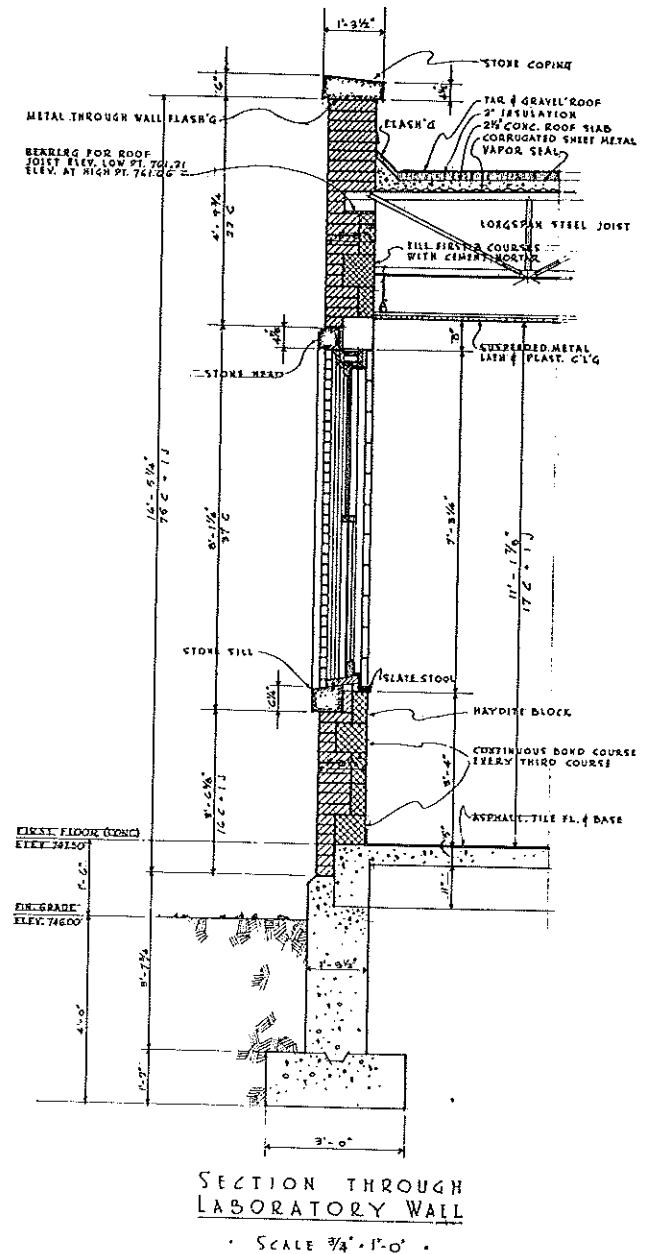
Typical section through wall of building shown in Fig. 21.12.
